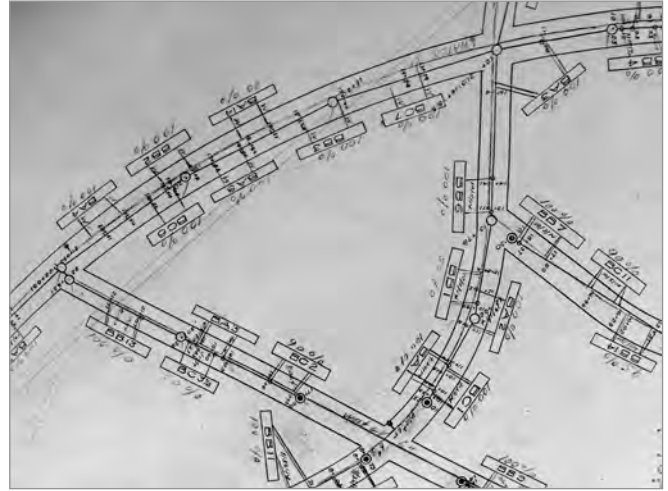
DETAILED PLAN OF BADIN SHOWING WHERE CERTAIN QUADRAPLEXES WOULD BE BUILT IN 1914, PIERSON AND GOODRICH. | BHM.
